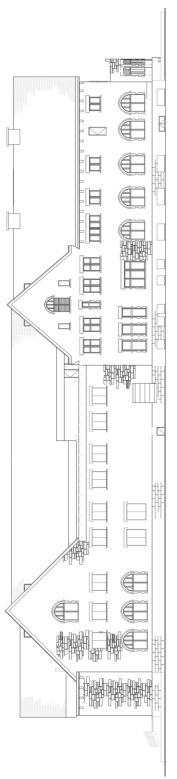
Sketch north elevation, not to scale. (JLK Architects 2025)
